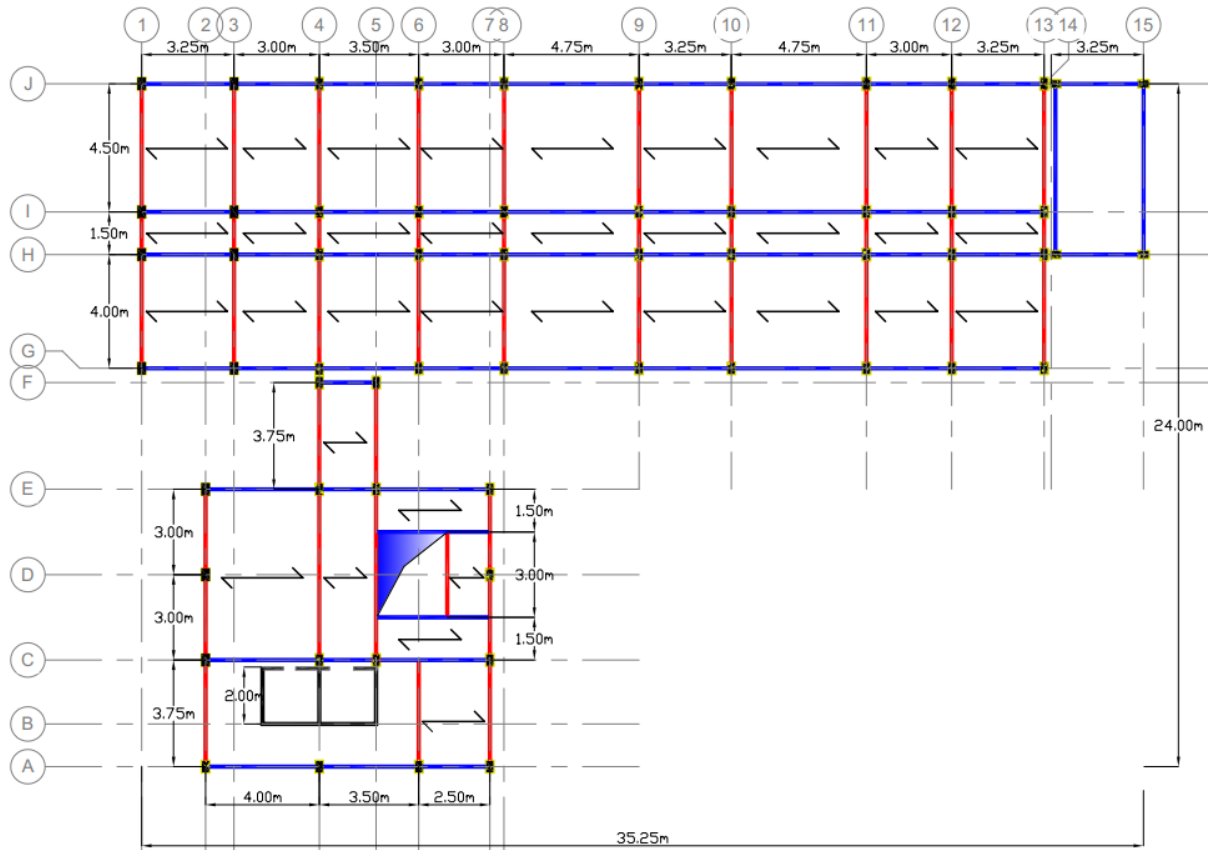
1. Structural plan from RDC to storey 5 of the case study
